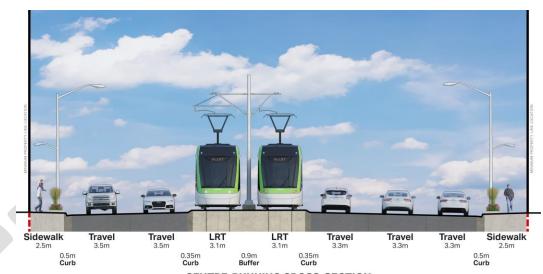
through Figure 2-11 show typical cross sections and key design dimensions along the route. Note that the depiction of the overhead contact system is conceptual and will be confirmed through future project design phases. Additional detailed cross-sections are included in Appendix B.
